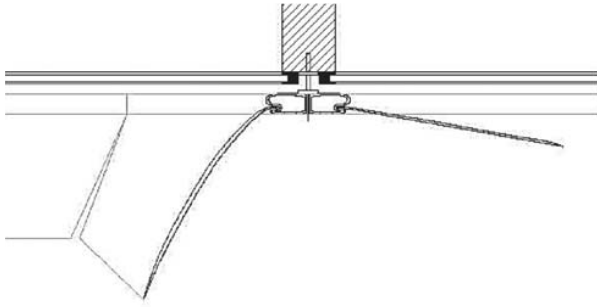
Detail of flectofin-principle attached to façade-sub construction [11]
